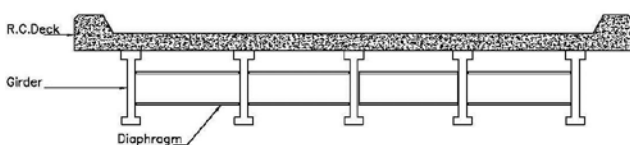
TYPICAL CROSS-SECTION IN COMPOSITE STEEL I-GIRDER BRIDGE
